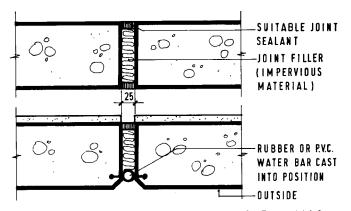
EXPANSION JOINTS IN CONCRETE WALLS
